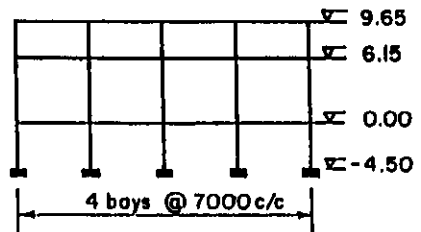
SCHEMATIC PLAN OF THE RESIDENTIAL BUILDING
